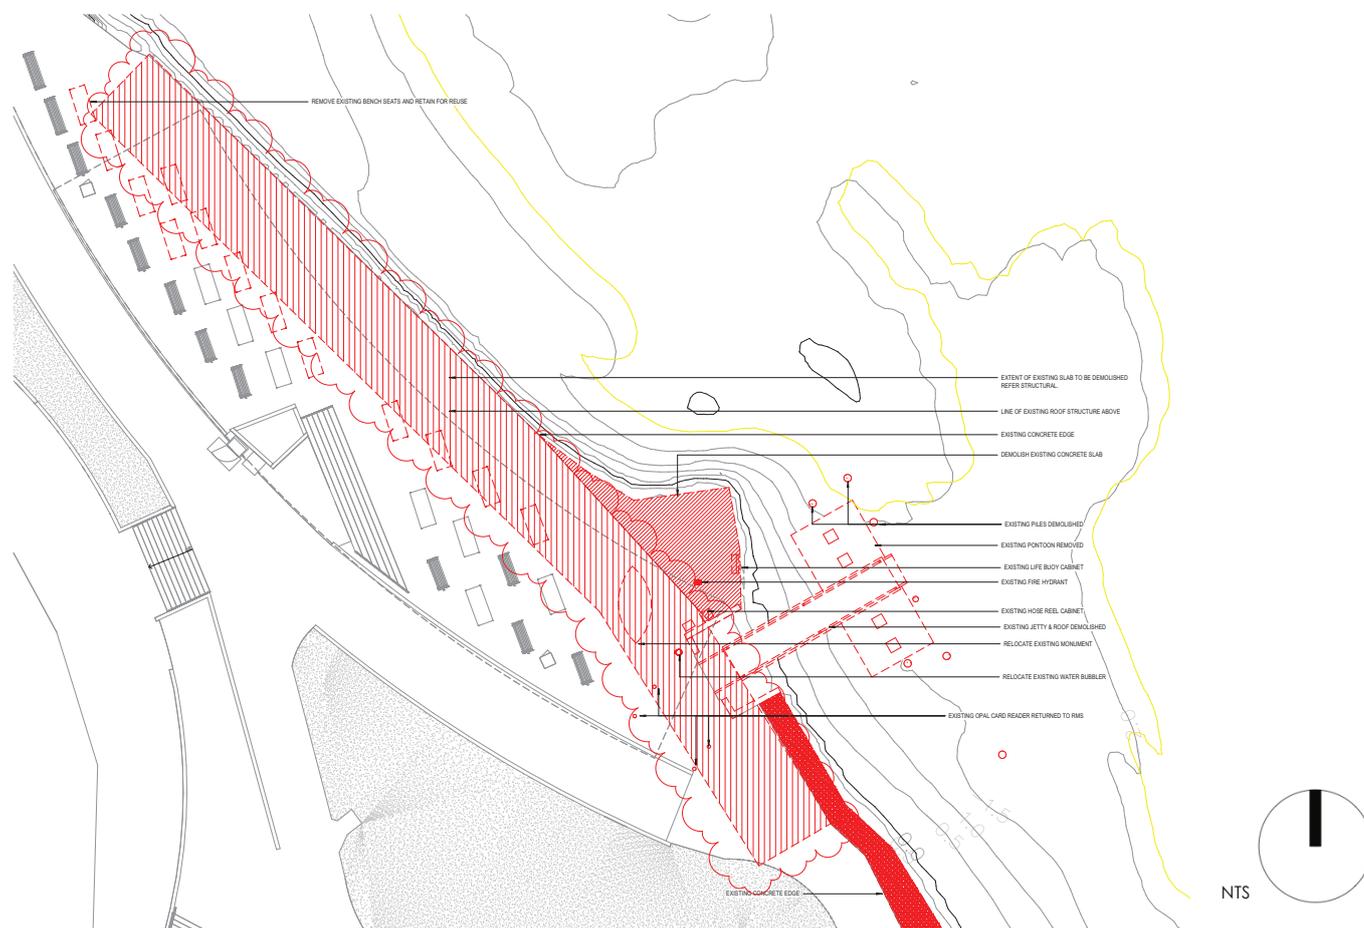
Demolition plan for landside infrastructure (plan courtesy of Conrad Gargett Ancher Mortlock Woolley) NTS
